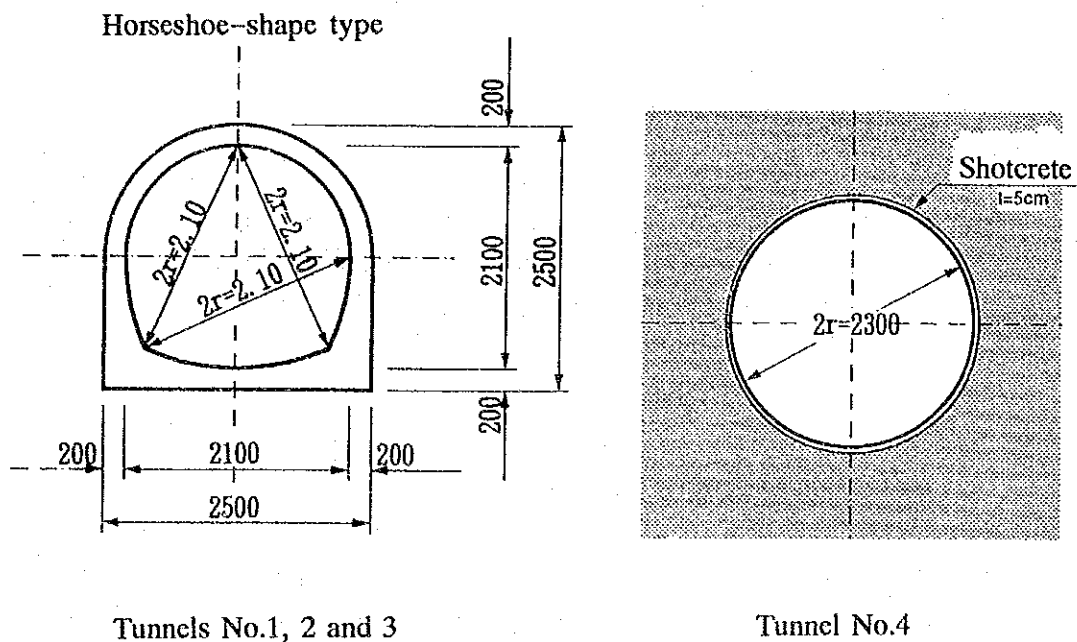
Standard Section of Tunnels (Head Race)
